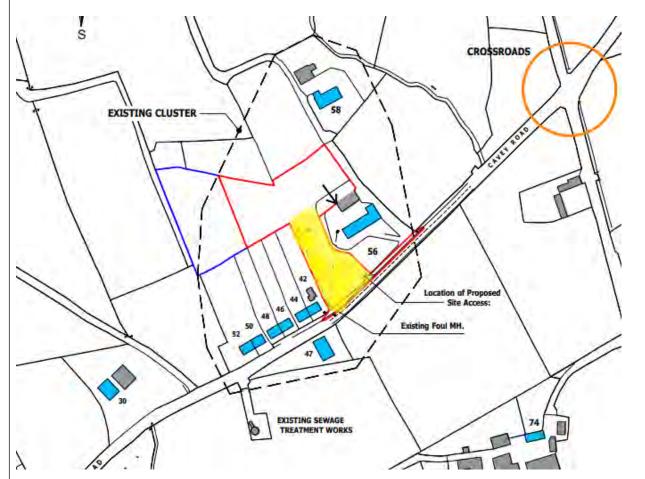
The site location plan above shows the area shaded yellow referred to in conditions 7 & 8.
